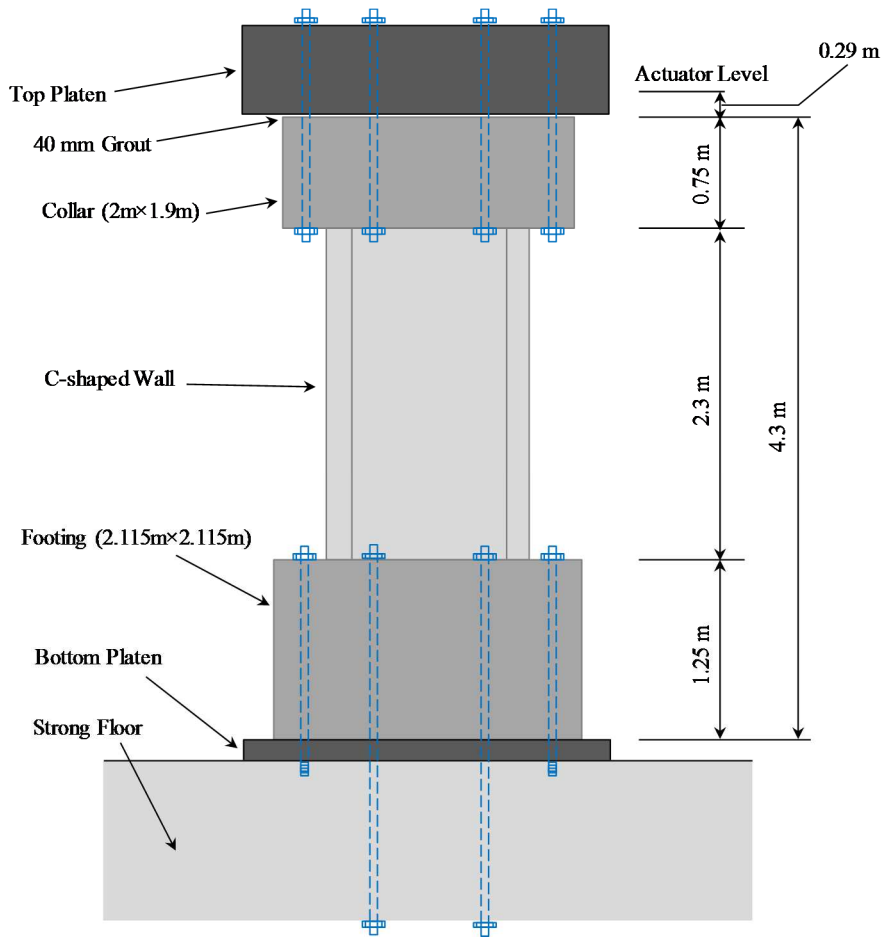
Elevation view of the C-shaped wall in the 6DOF system (Mechmachi and Bouaanani, 2018)
